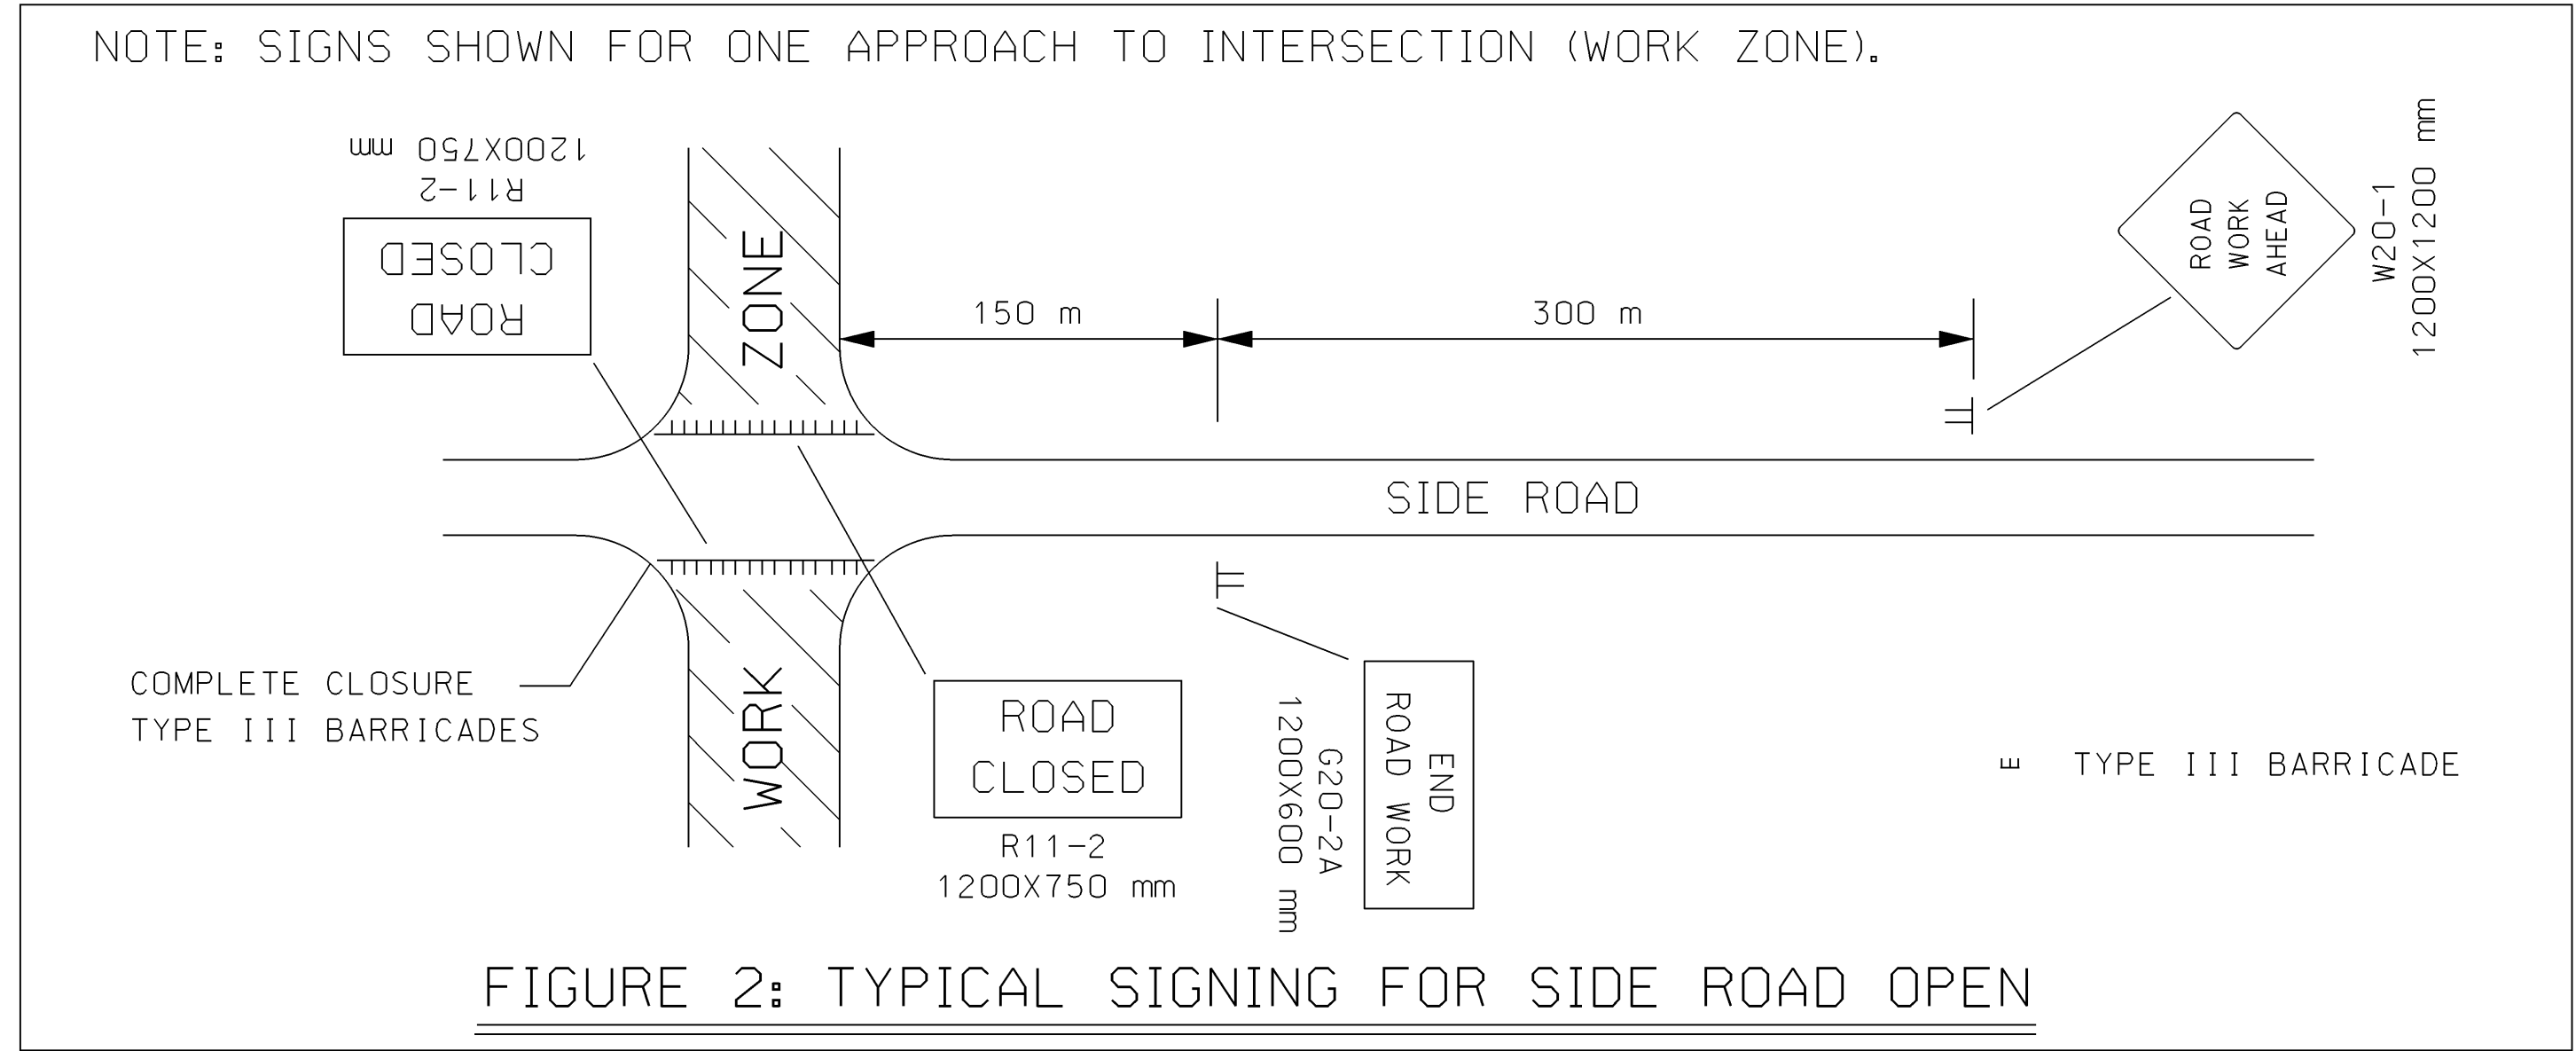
TYPICAL SIGNING FOR SIDE ROAD OPEN
